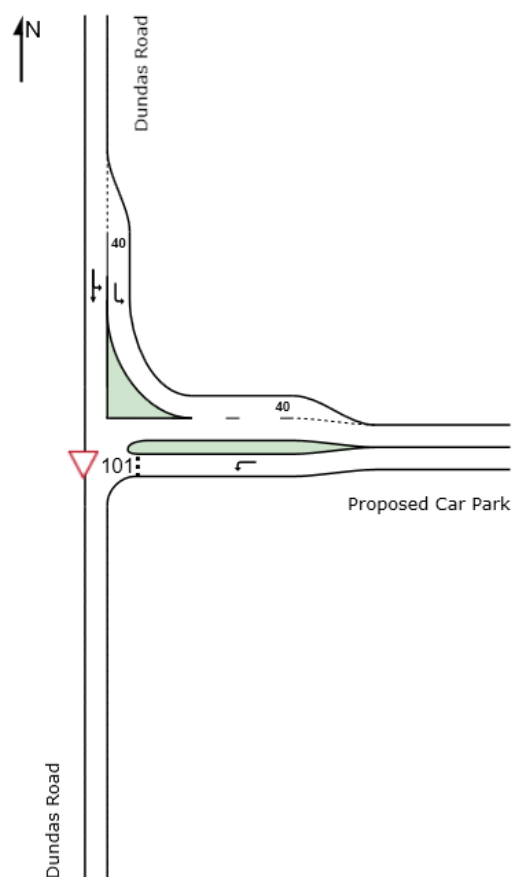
Intersection 6 – Proposed Service Road/ Proposed Access 1
